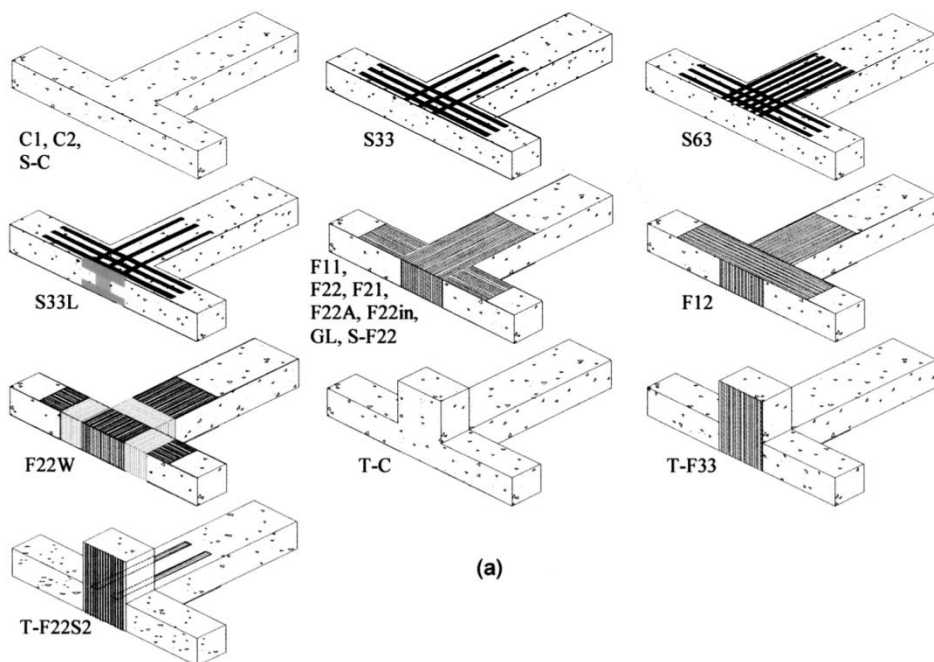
FRP strengthening layouts for exterior T-joints (Antonopoulos and Triantafillou, 2003).
